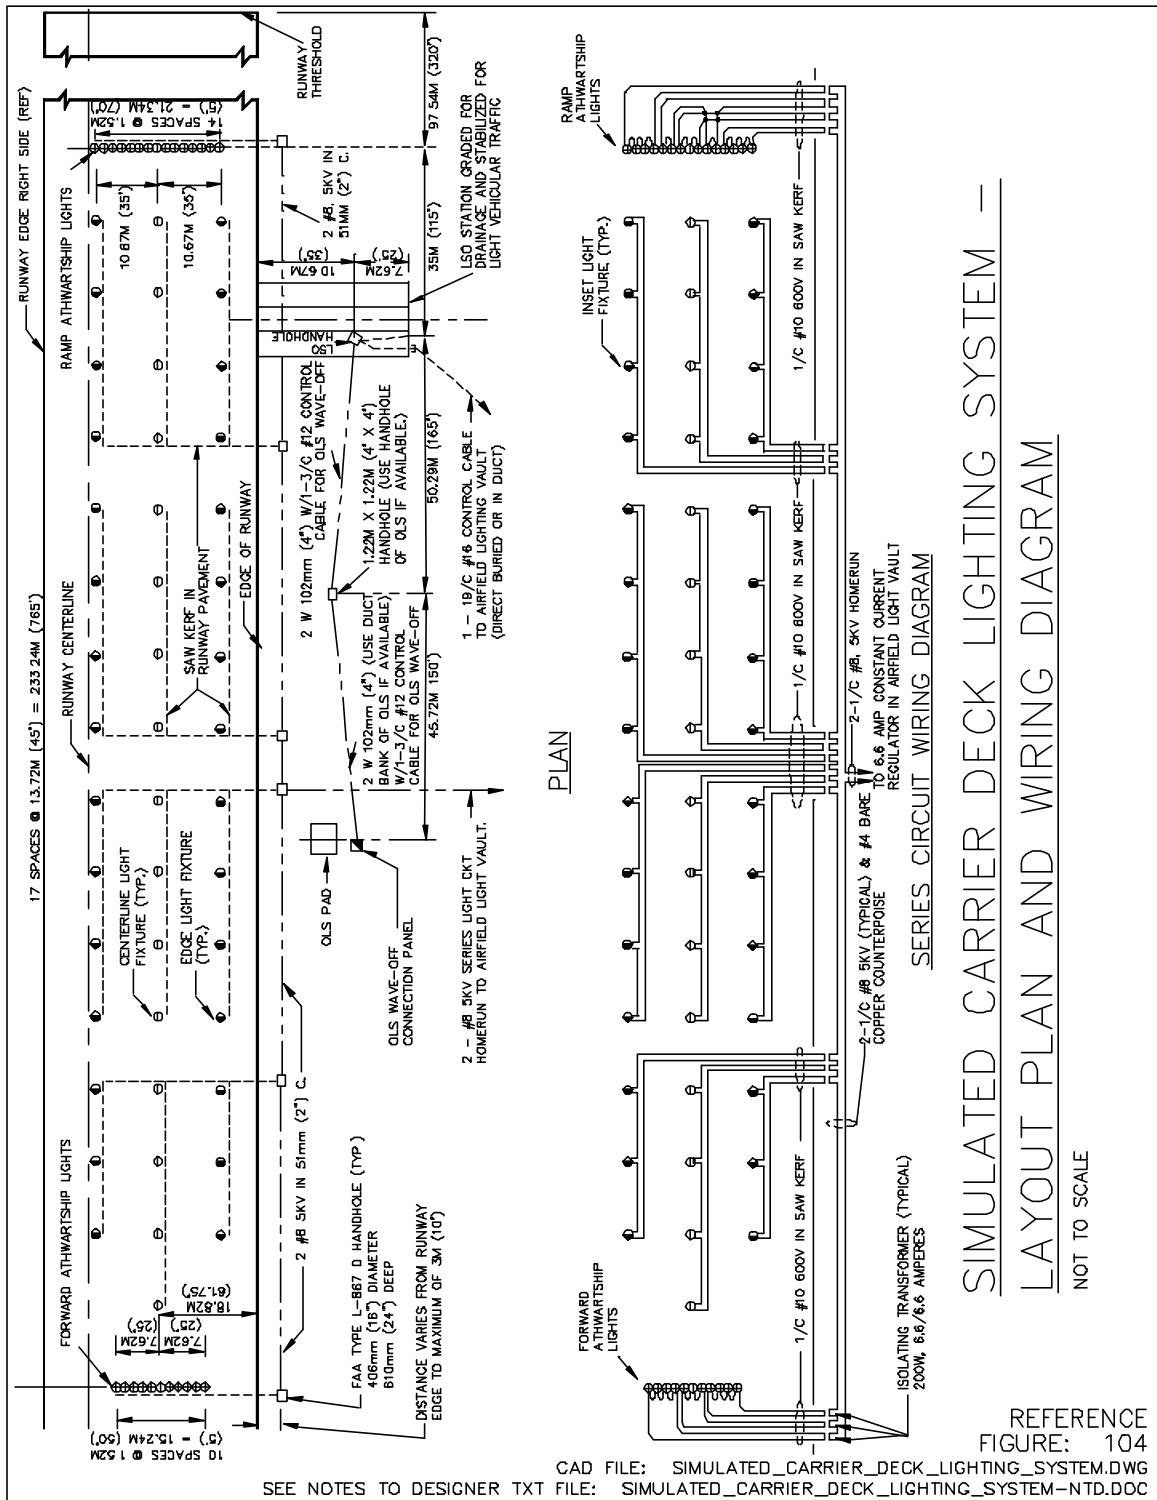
Simulated Carrier Deck Lighting System Layout Plan & Wiring Diagram
